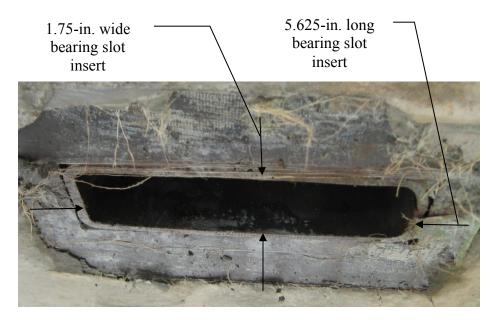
Bearing slot (1.75 in. x 6.75 in.) insert made of galvanized steel for expansion bearing set-up
